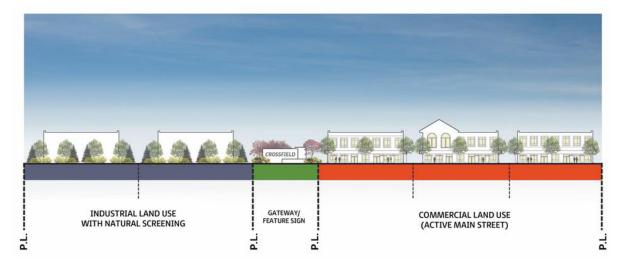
Elevation 3 – Industrial / Commercial Gateway Concept
